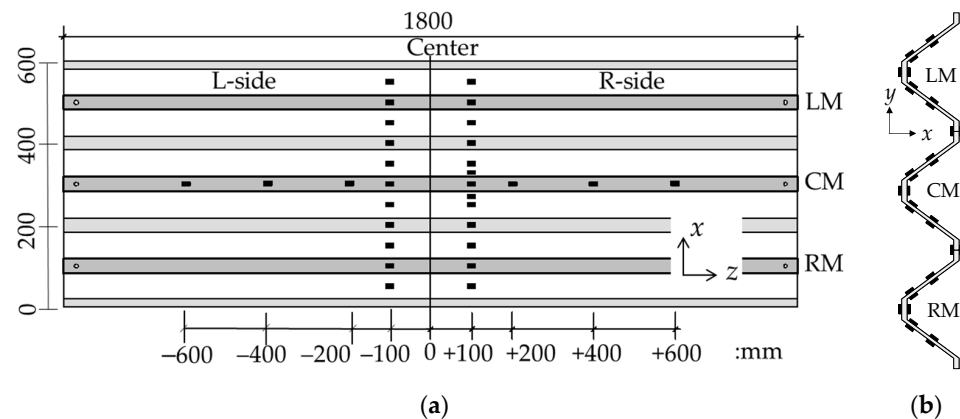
Strain measurement position. (a) Ground plan and (b) elevation.
